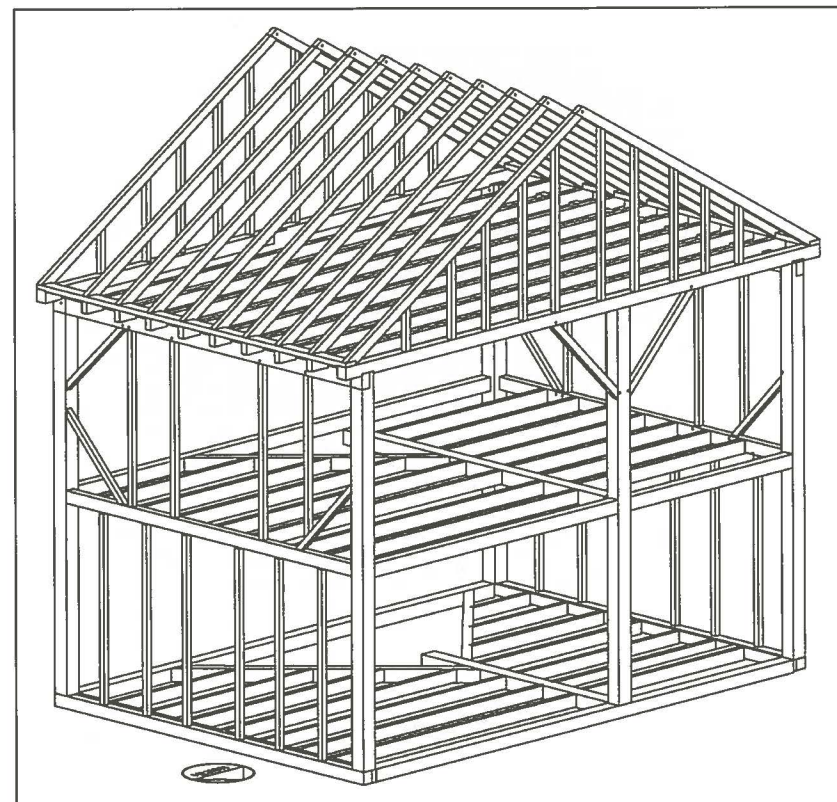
Shivers House 1742 Frame, a Type of Simplified Anglo-American Box Frame. Note Joists and Beams of Same Height, Up and Down Braces, Straight Posts and Timber False Plate.
